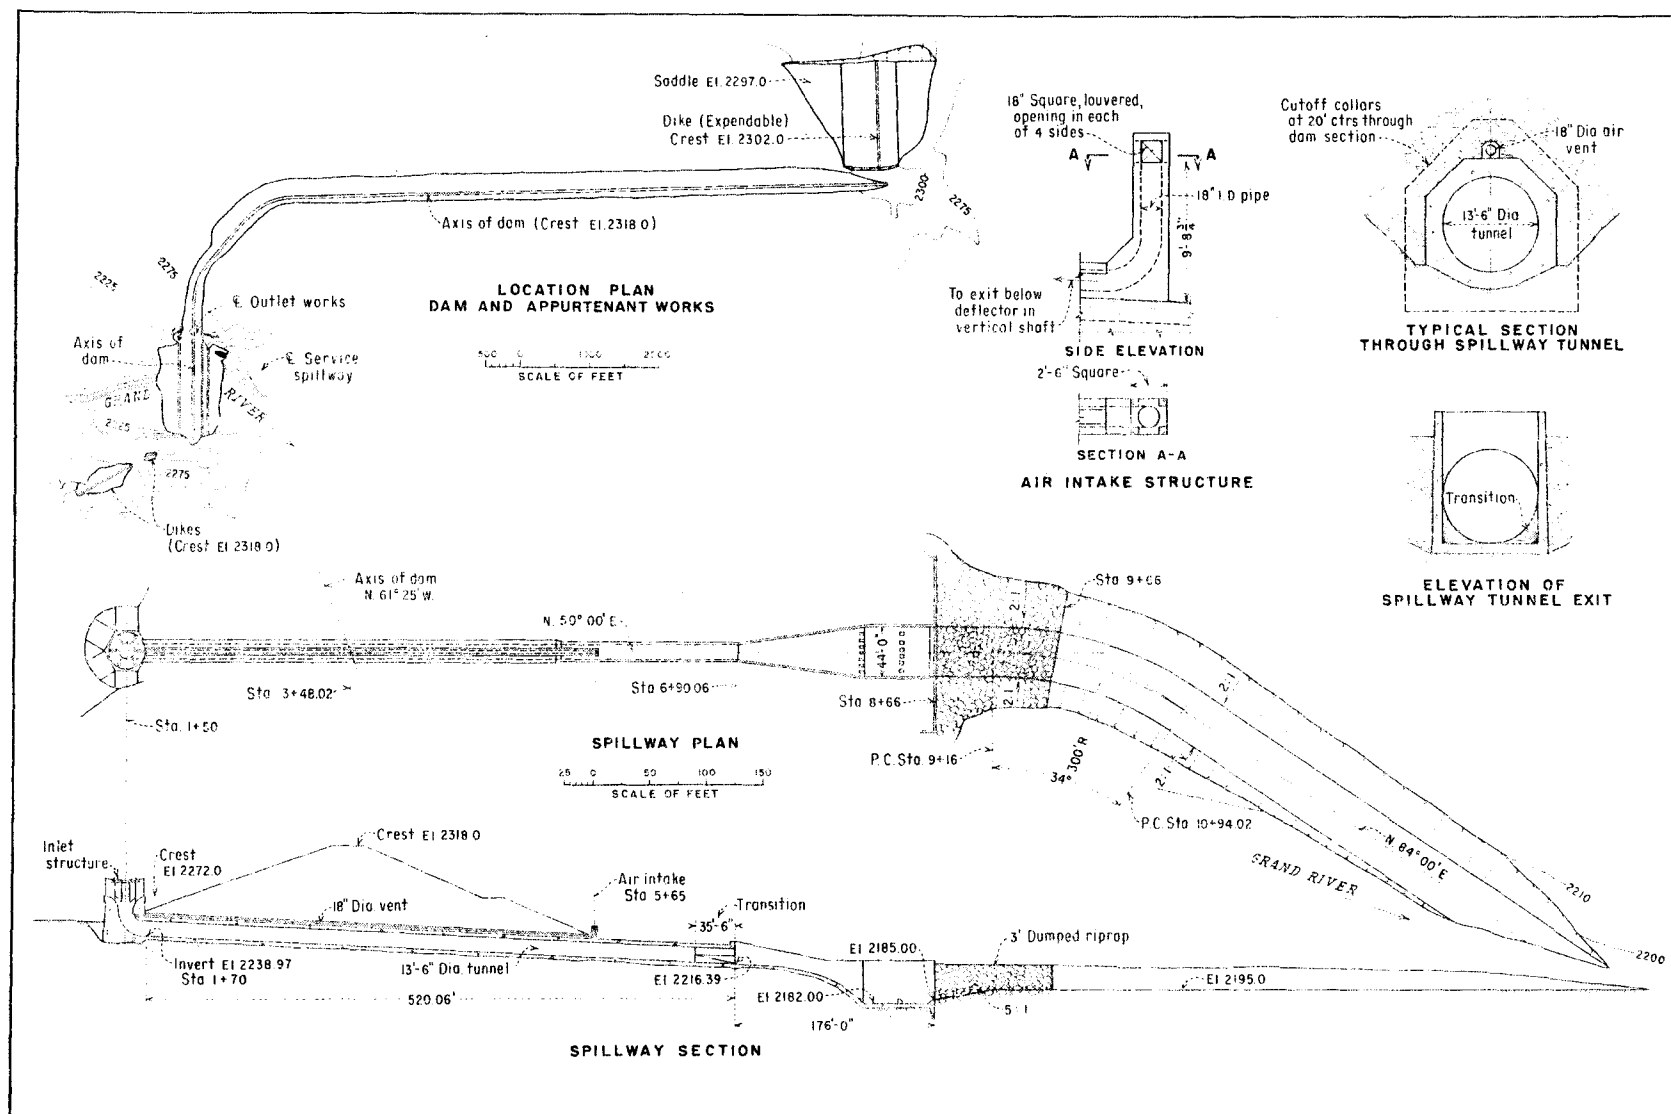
General plan and sections of the spillway at Shadehill Dam.
